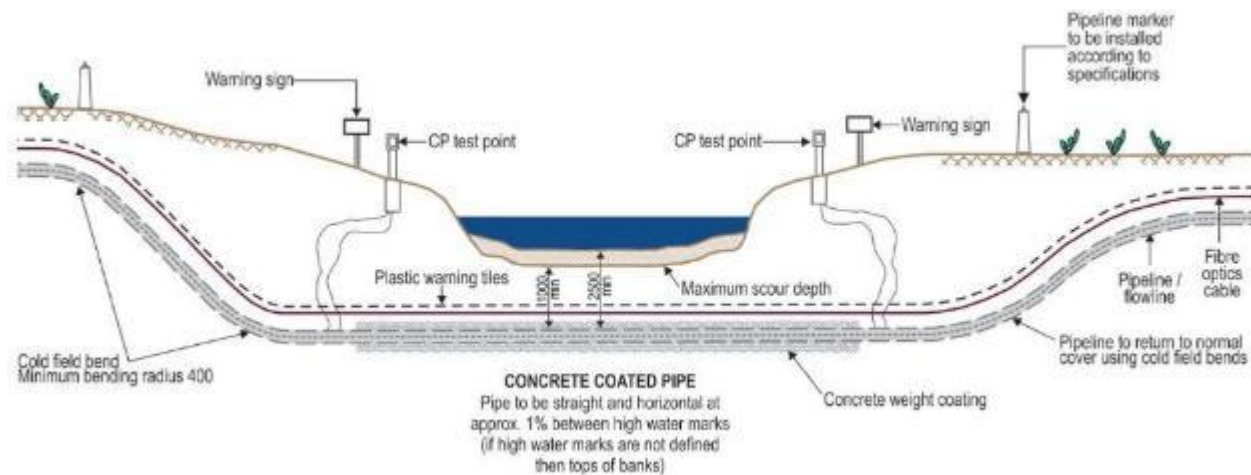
Cross section of a flowline crossing of a drainage line (typical detail)
